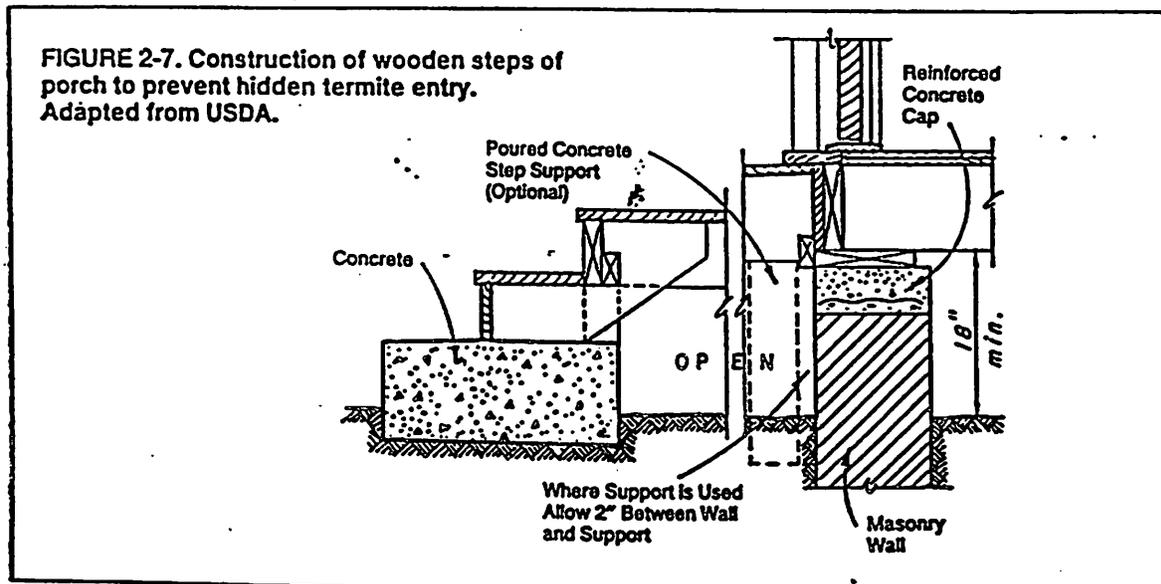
Construction of wooden steps of porch to prevent hidden termite entry. Adapted from USDA.
